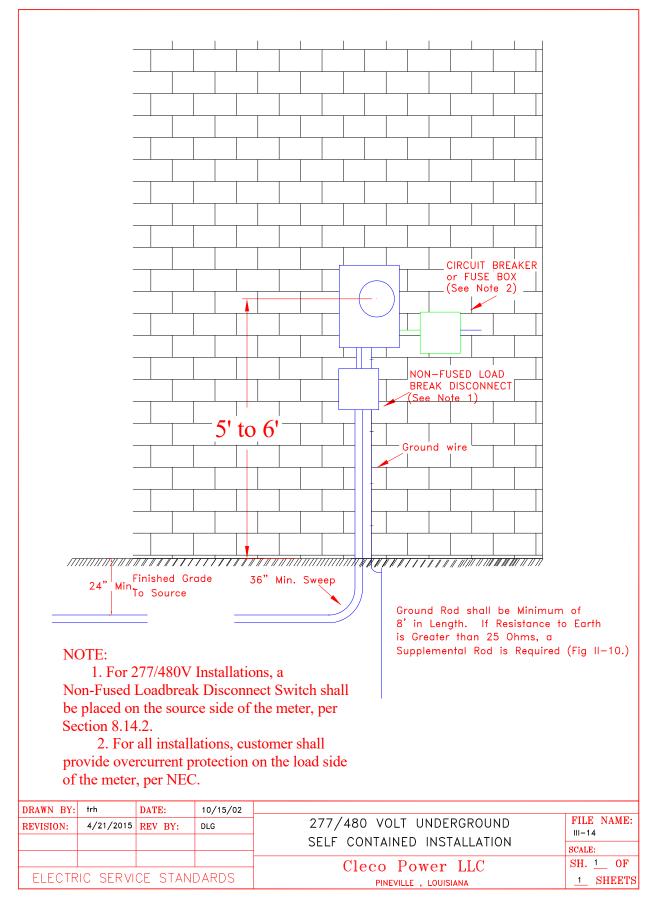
277/480 Volt Underground Self-Contained Installation
